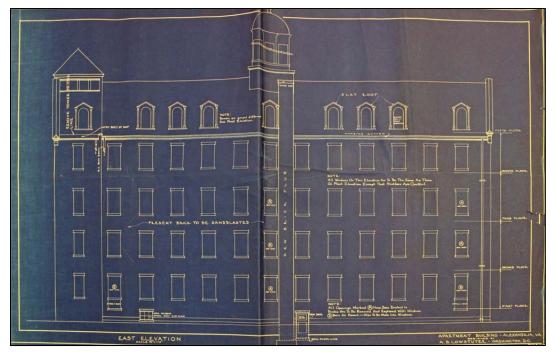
1935 A.B. Lowstuter's Design for Belle Haven Apartments. East Elevation. Courtesy of Alexandria Local History Special Collections. Drawing notes the installation of a new brick flue in the center of the elevation, a new window and door at basement level, windows to be converted into doors, spatial arrangement of dormer windows, and removal of height from the elevator tower.
